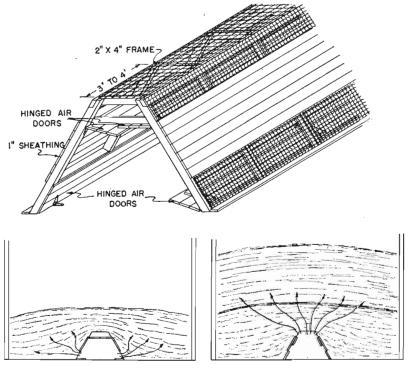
Top, a section of the modified A-frame duct showing hinged air-door arrangement and method of construction. Bottom left, cross section showing upper doors closed and lower doors opened for drying first loading. Bottom right, same duct with lower doors closed and upper doors opened for drying second loading or deeper stacks.
